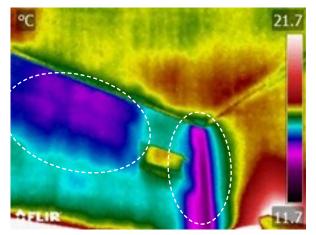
IR image showing top of external wall, next to door between Office 2 and 3
